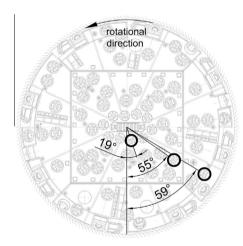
Cutterhead with three sensor-equipped disk cutters (cutterhead picture (c) Aker Wirth).
